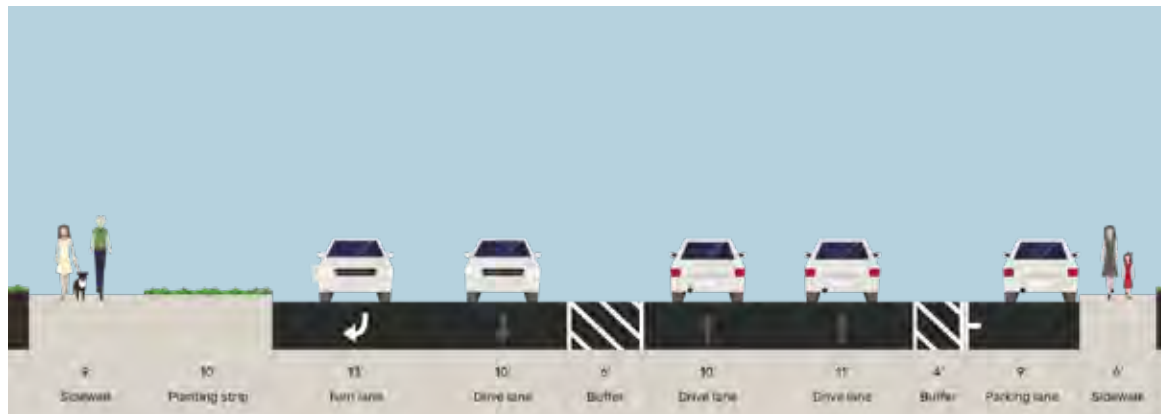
North Frontage Road - Existing Cross Section (at Safeway Driveway, Eastbound)
